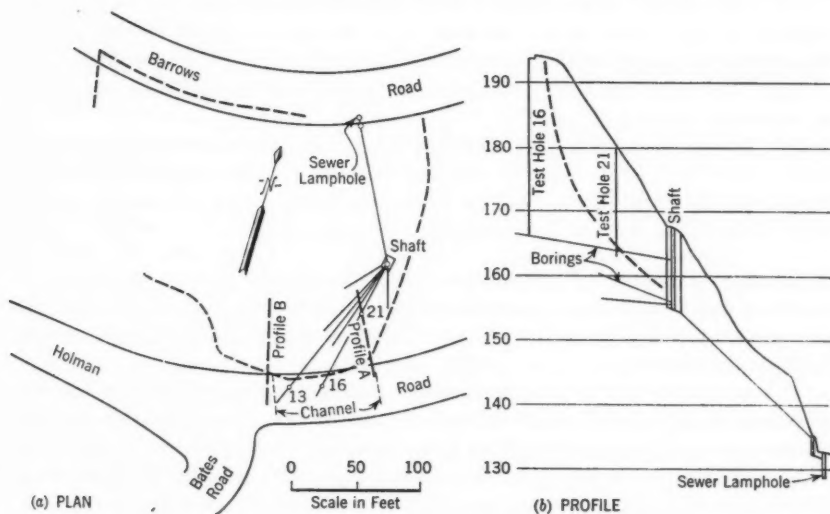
PLAN AND PROFILE, BARROWS-HOLMAN SLIDE, OAKLAND, CALIF.
